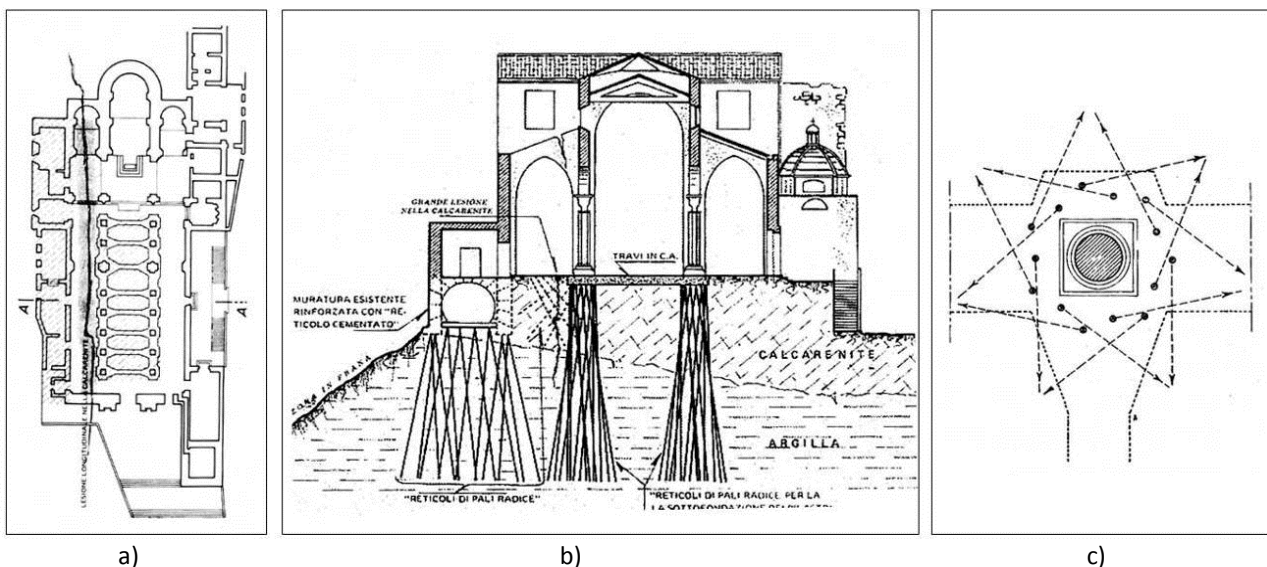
Strengthening design of the foundations of Agrigento cathedral. a) Plan of the cathedral with the linear crack along the aisle; b) section of the building with the design of the concrete piles; c) layout of the grid design for the concrete piles around a pillar (pictures reassembled by the author from G. Carbonara, "Trattato di restauro architettonico", vol III, UTET, 2007, p. 669 (Carbonara G., 2007)).
